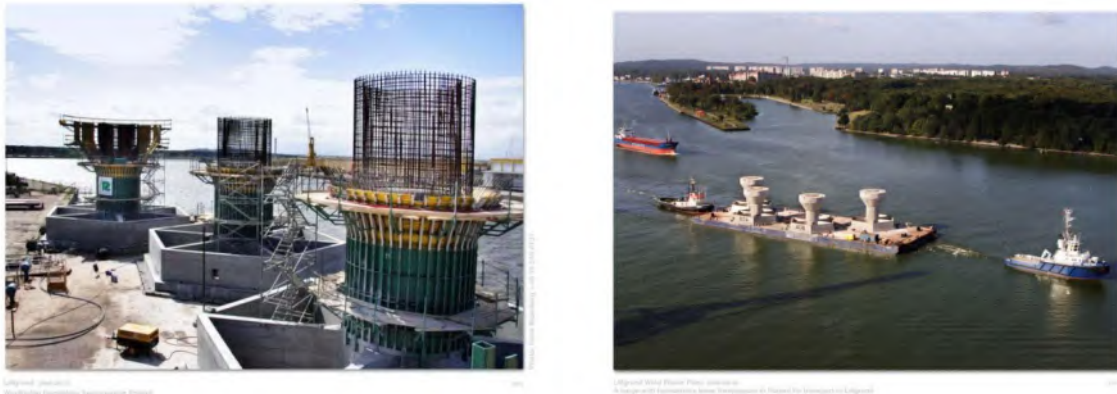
Transportation of WT foundation structures (photos by Jeppsson et al. 2008).
